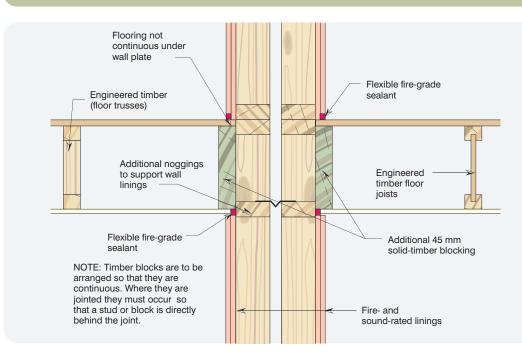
Joist parallel to wall – double joist detail – FRL 60 minutes – elevation view.
